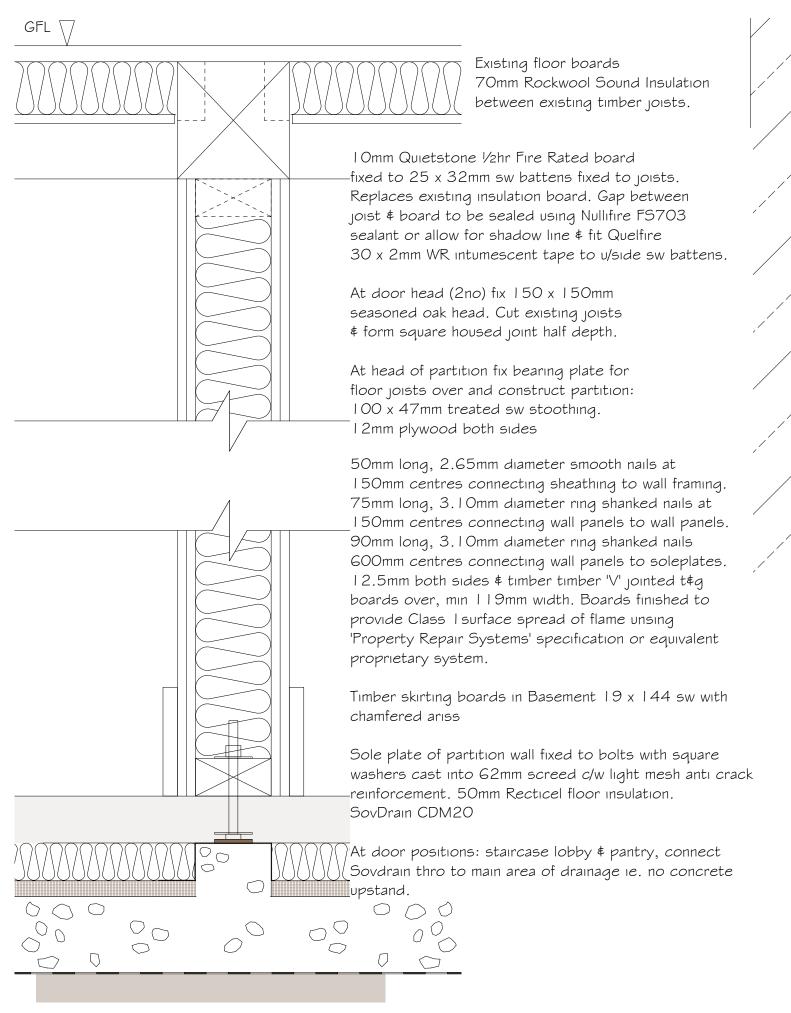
/11 Date: SEPTEMBER 2017 Scale: 1/50
